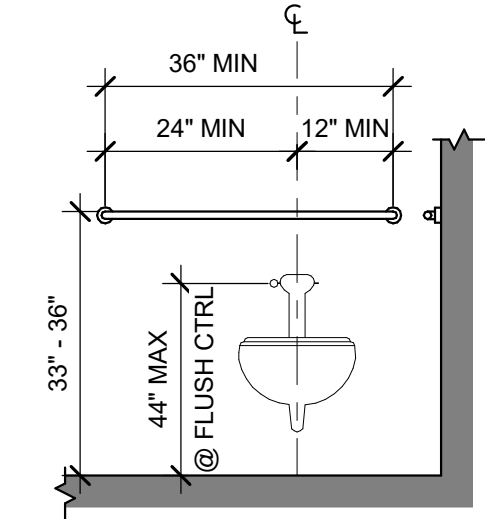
B 604.5.2 Rear Wall Grab Bar W.C. 10
